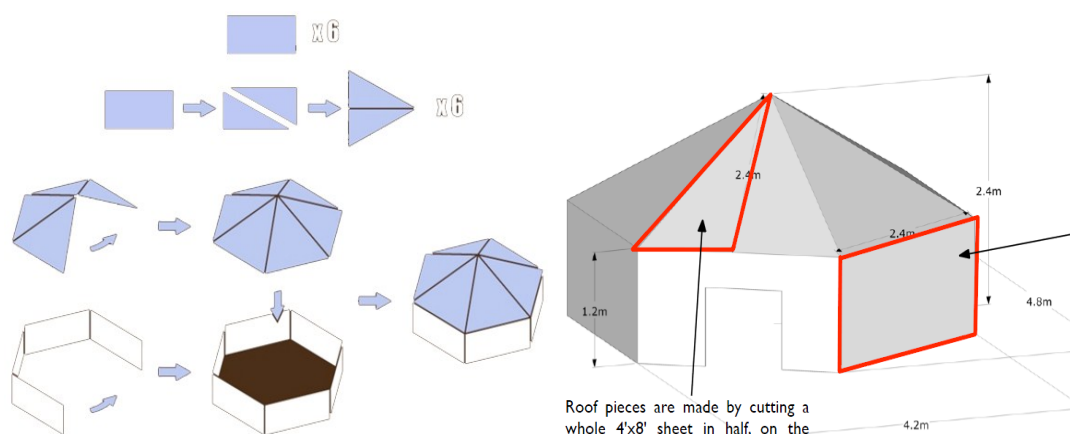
An 8'x4' rectangle sheet of Hexayurt (http://www.tilings.org.uk/Hexayurt_Family.pdf).
